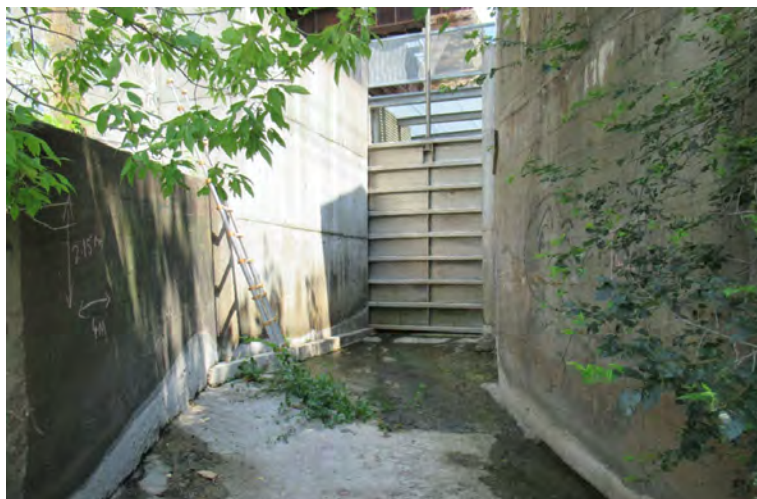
The sluiceway is a concrete channel with a metal gate to carry excess water.
